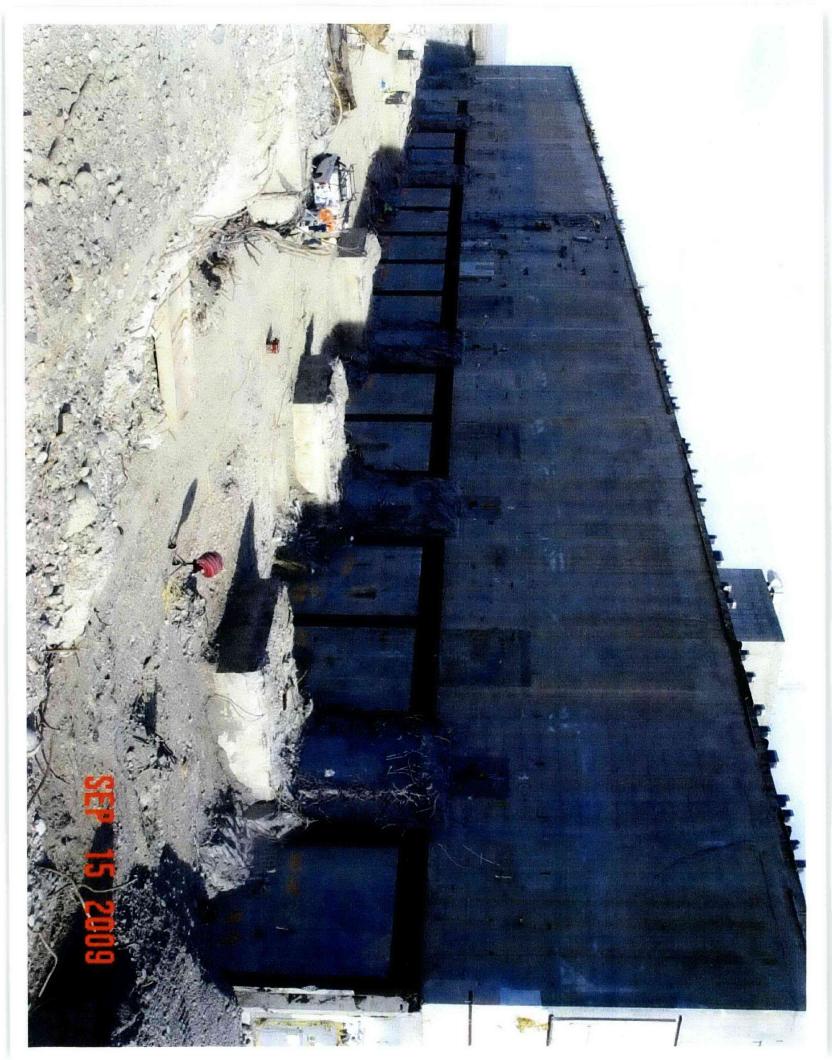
Cold Joints along 109-N SSE boundary wall
